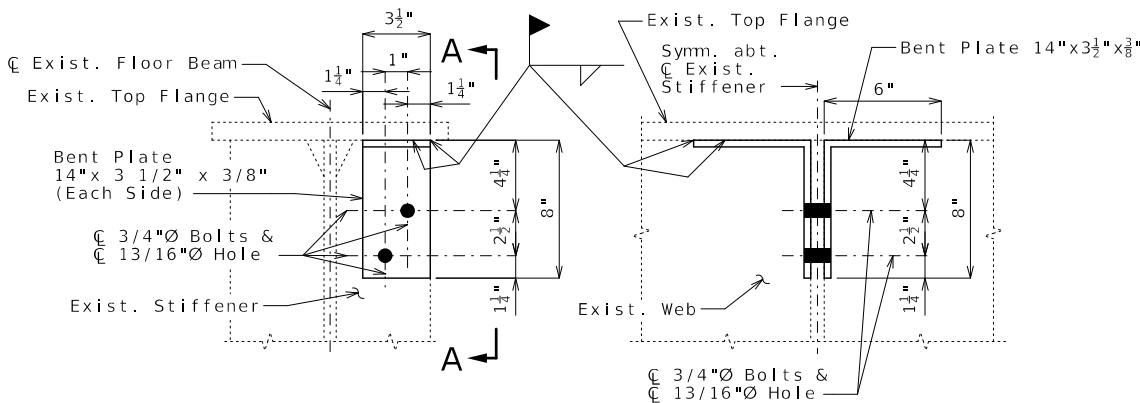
DETAIL OF BENT PLATE AT BOTTOM FLANGE OF FLOOR BEAM
